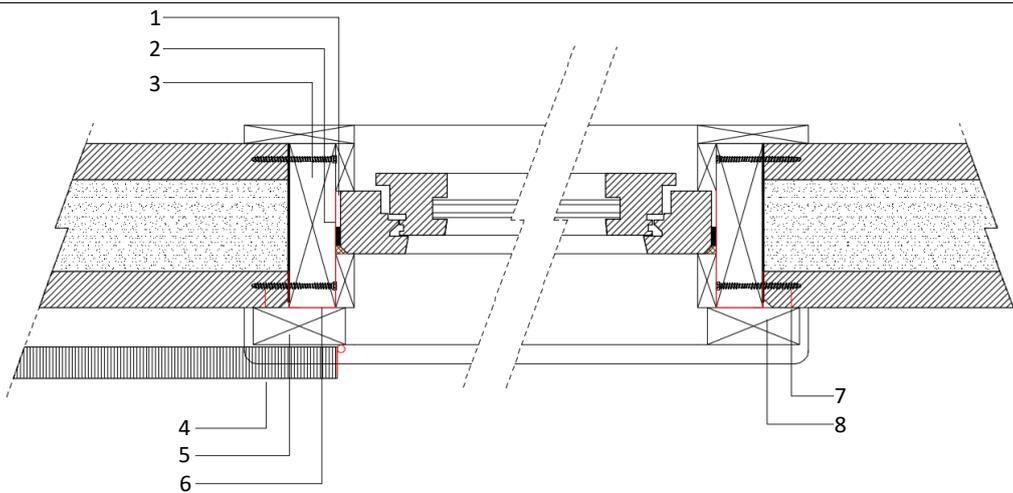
Exterior Wall (NATURLAM W180 Bilam) – Window transversal cross section
